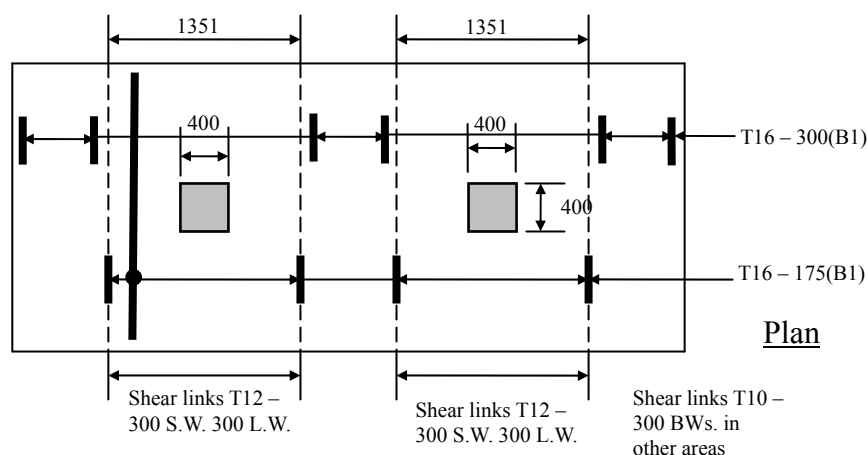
(c) – Reinforcement Details for Worked Example 11.1 (in the direction perpendicular to the line joining the two columns only)
